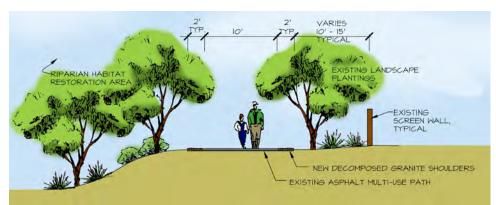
F: Typical Cross-Section Stella Road - South Approximately 1,000 Feet
